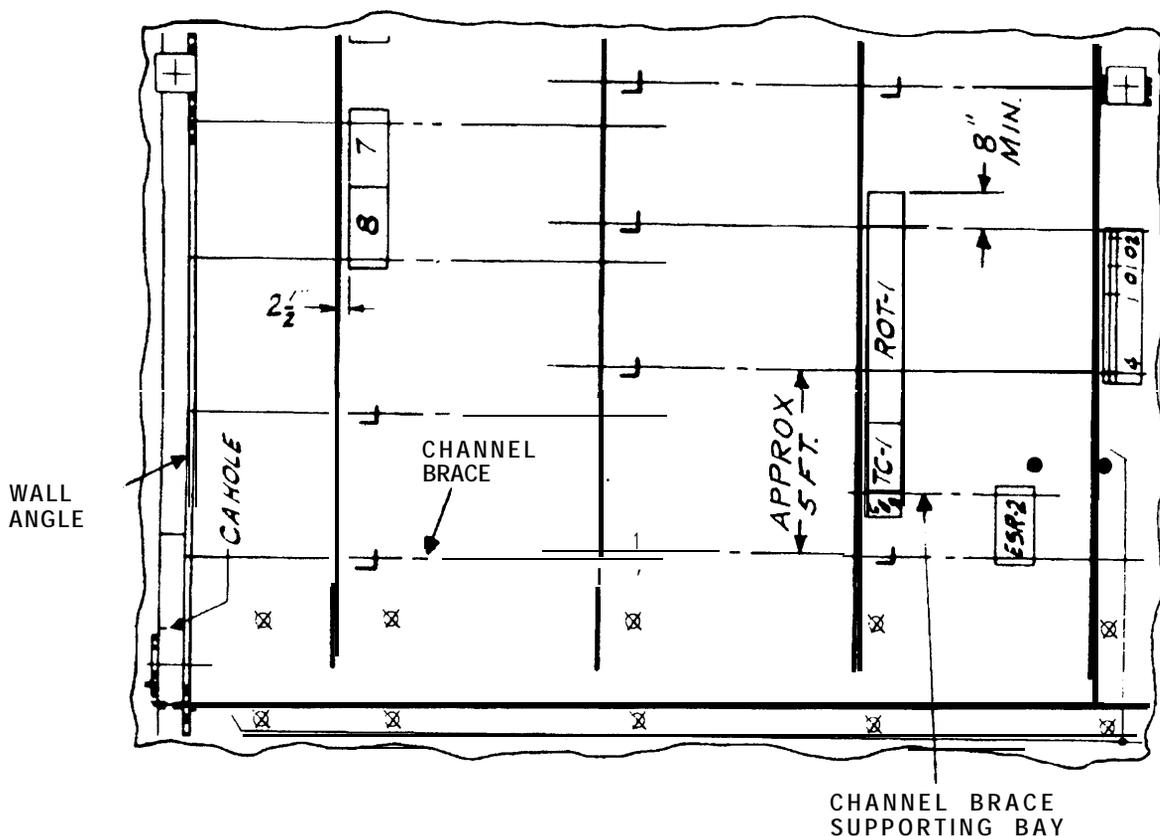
Portion of F Drawing Showing Location of Channel Brace and Wall Angles.
